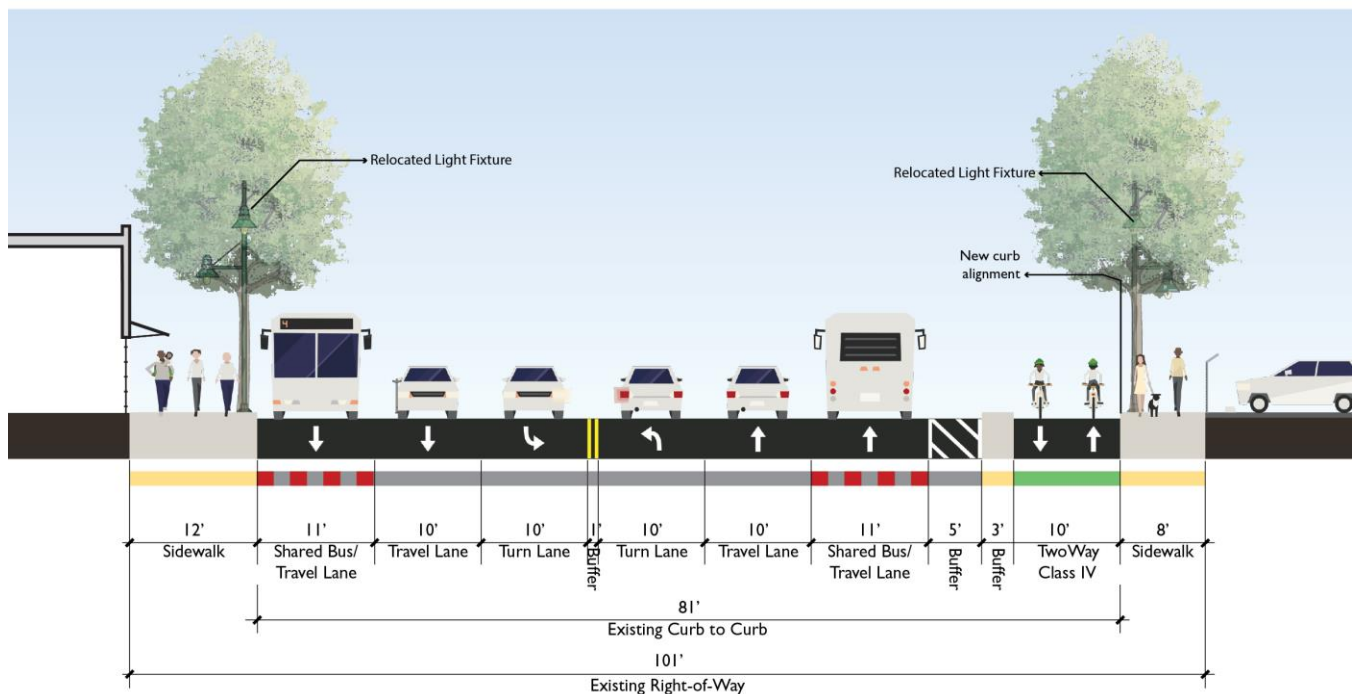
40th Street between San Pablo Avenue and Emery Street (looking west) – SECTION D
